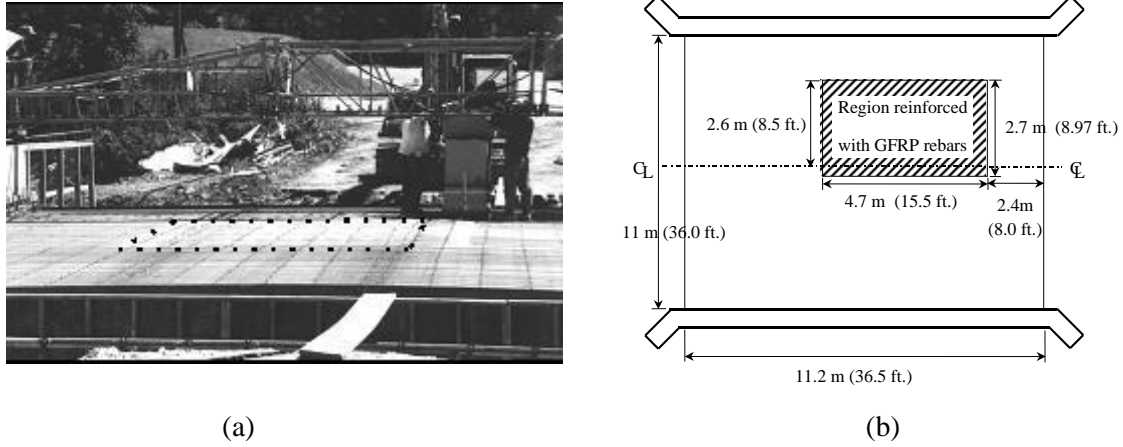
(a) Roger's Creek Bridge prior to concrete deck placement; (b) Plan view of bridge deck showing the location of GFRP rebars
